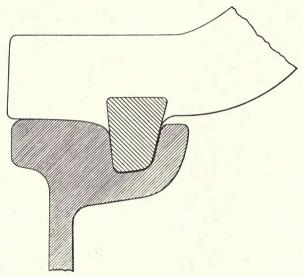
Rail Gauge showing both Track and Tread Gauge.
